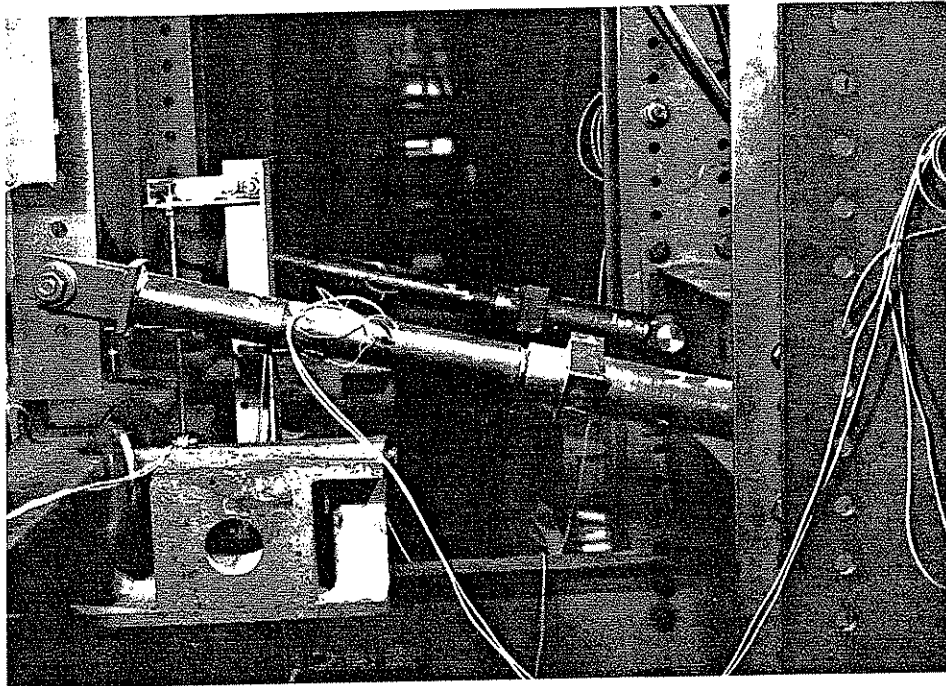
Sections clamped to bottom flange and rods used to induce distortion
